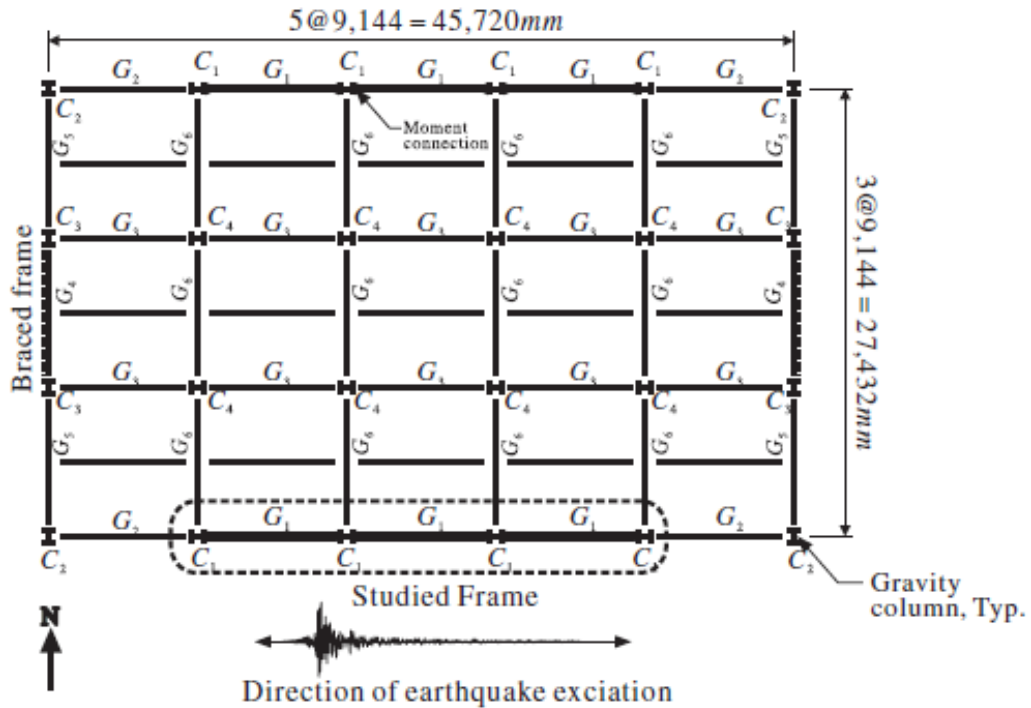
Plan view of a six-story framed prototype building (Kim and Christopoulos 2009b)
